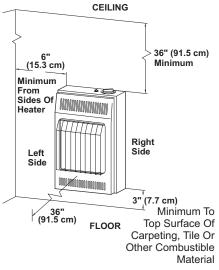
Mounting Clearances As Viewed From Front of Heater
